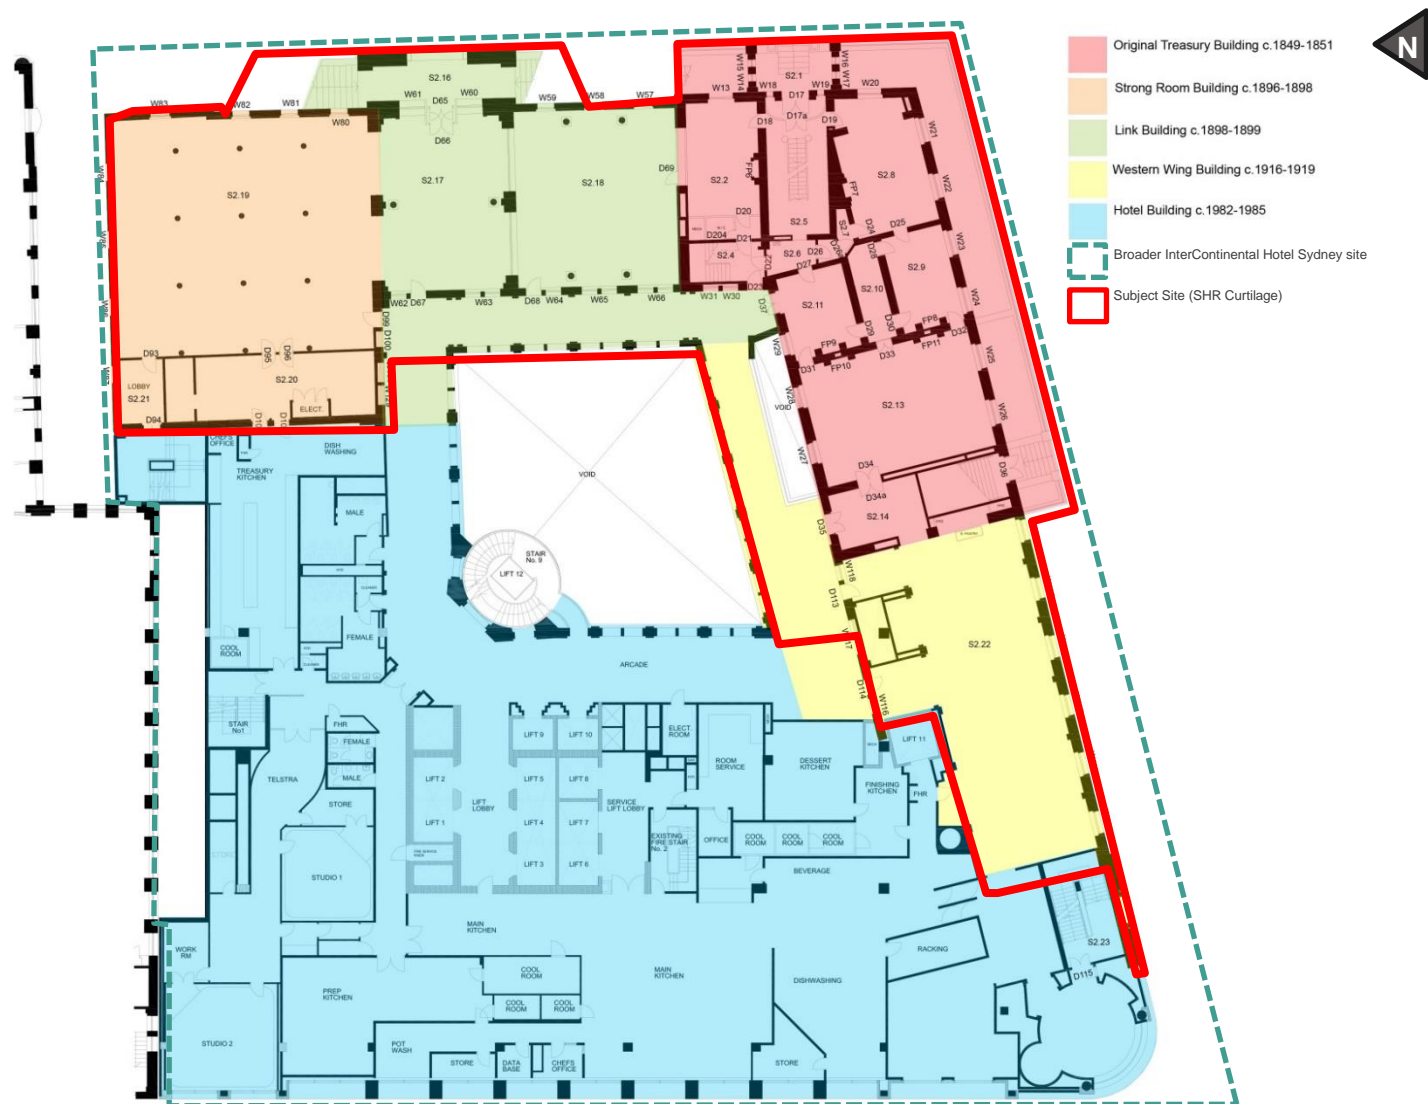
Extract of 'as built' plans showing period of construction – Ground Floor
